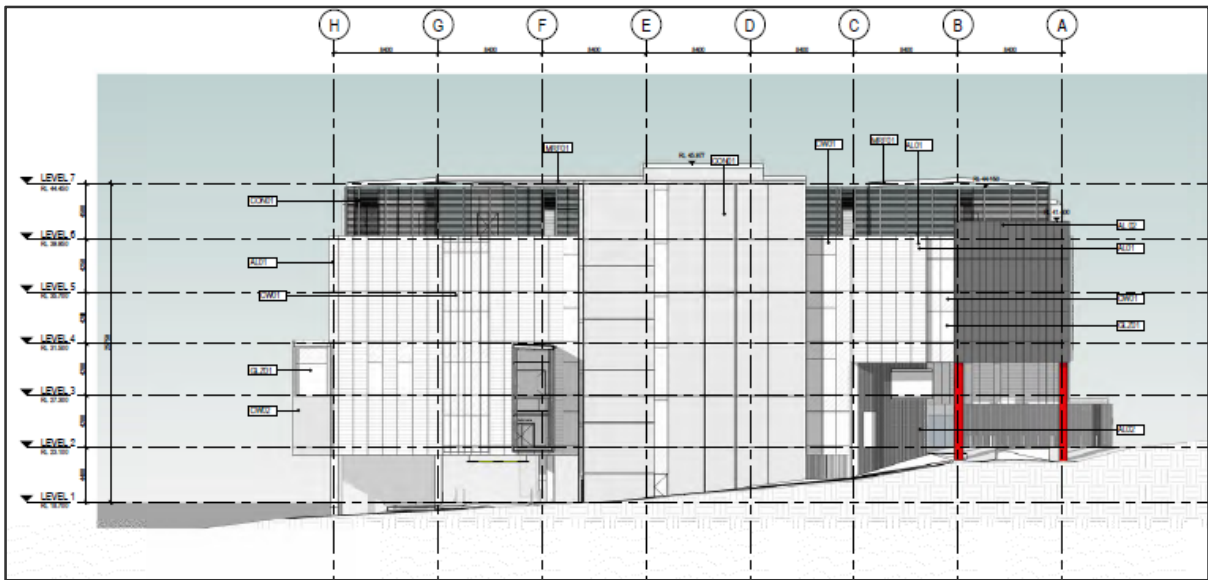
| Eastern elevation (Source: Applicant's RtS)
